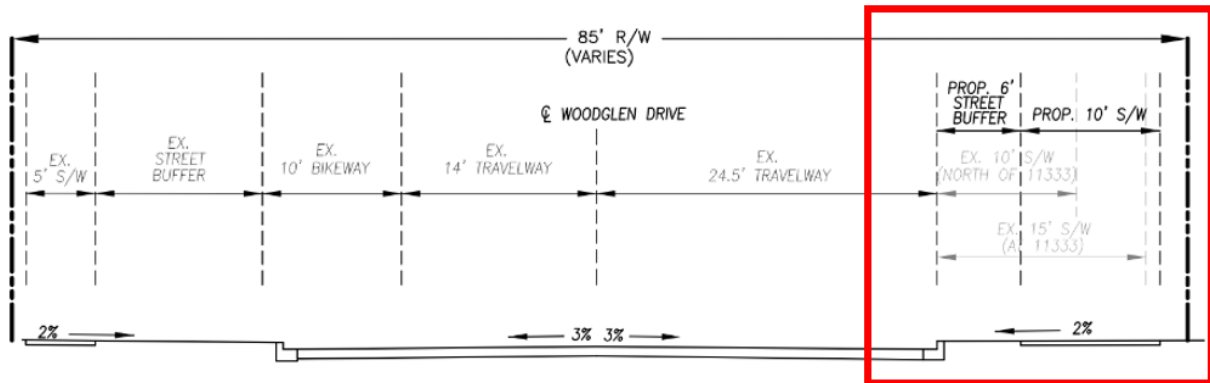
Woodglen Drive Cross-Section, Looking north with Subject Property Frontage in Red
